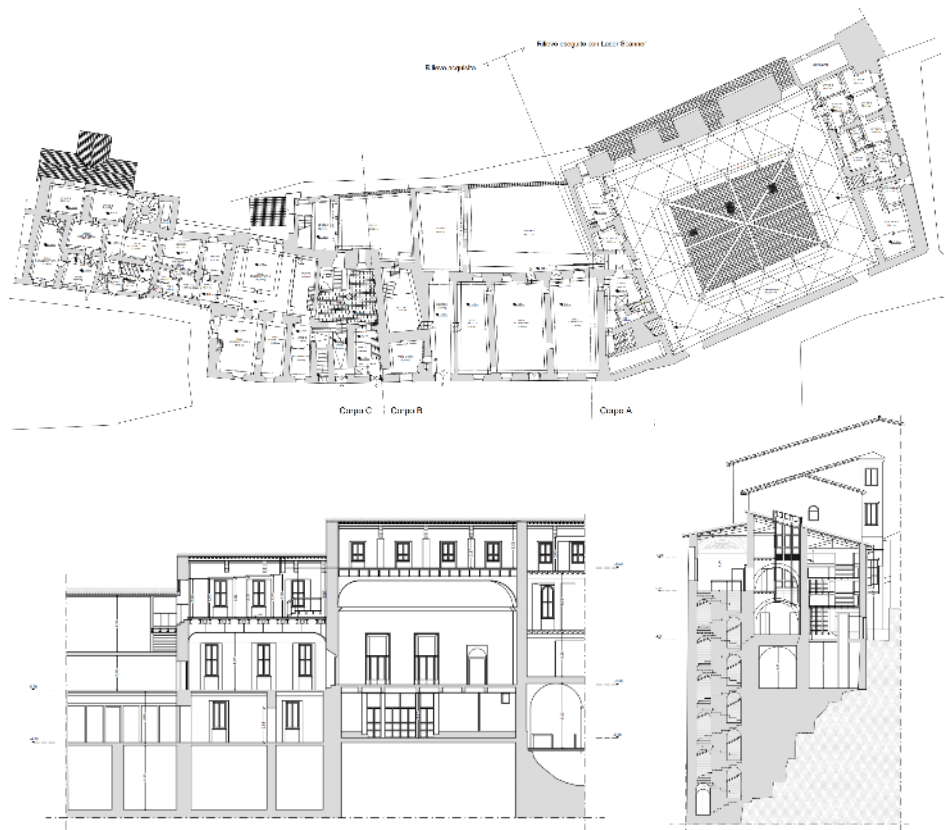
Ducal Palace in Camerino, Italy: (a) plan view $Q = + 0.00$. (b) section views
